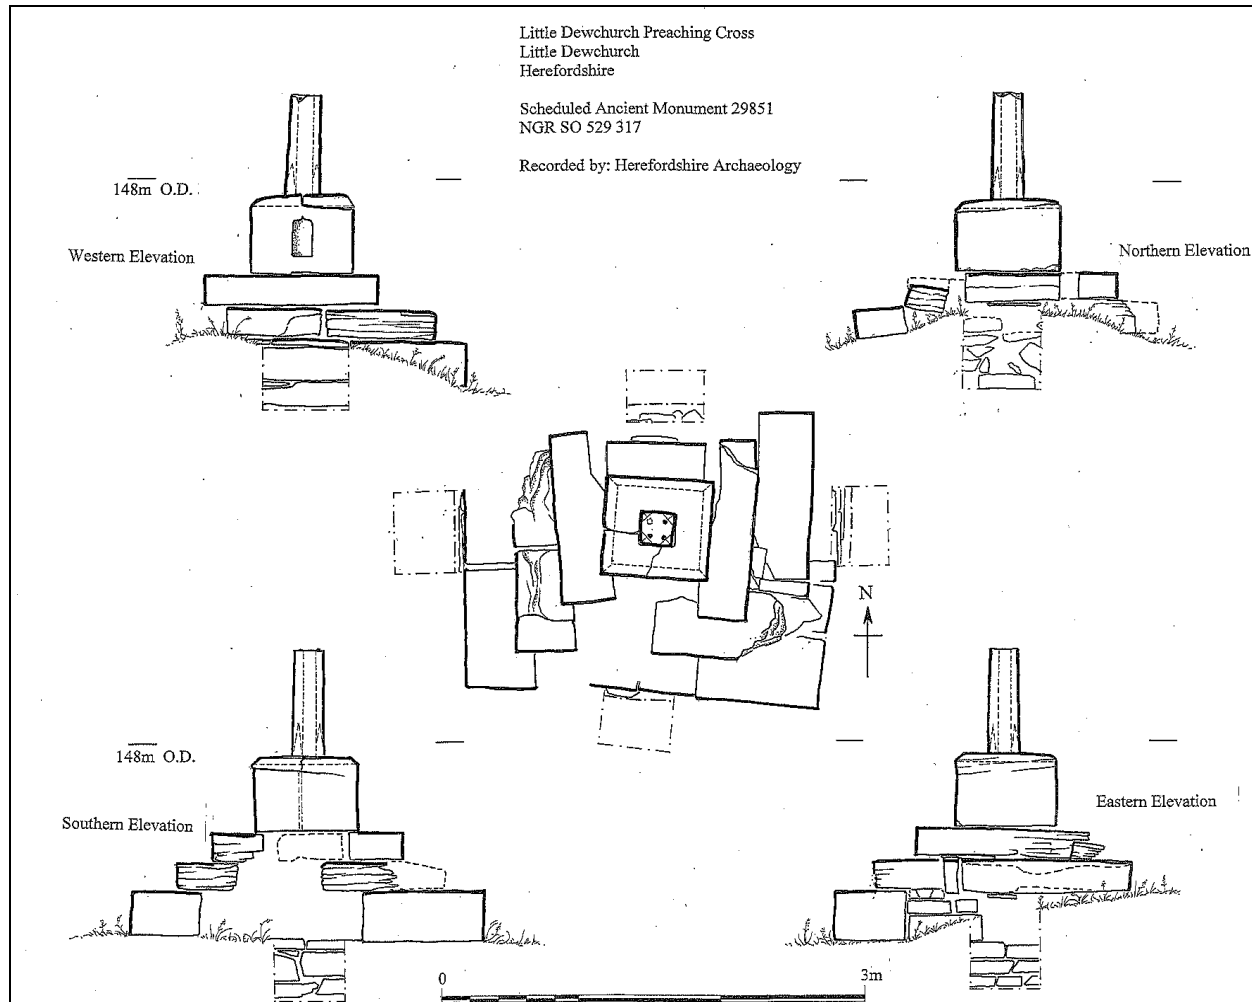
Plan and elevations of Little Dewchurch preaching cross base.
